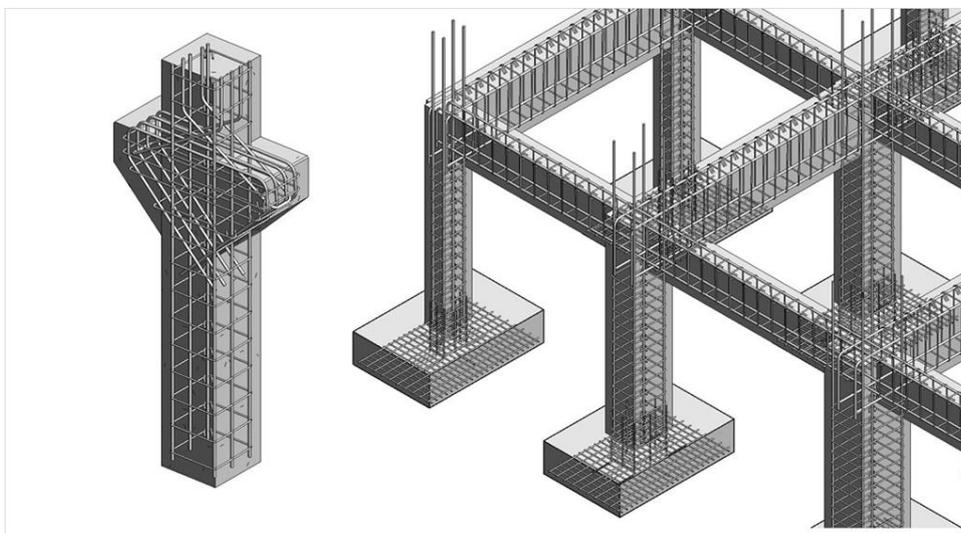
Overview of concrete's reinforcement in Revit®.
